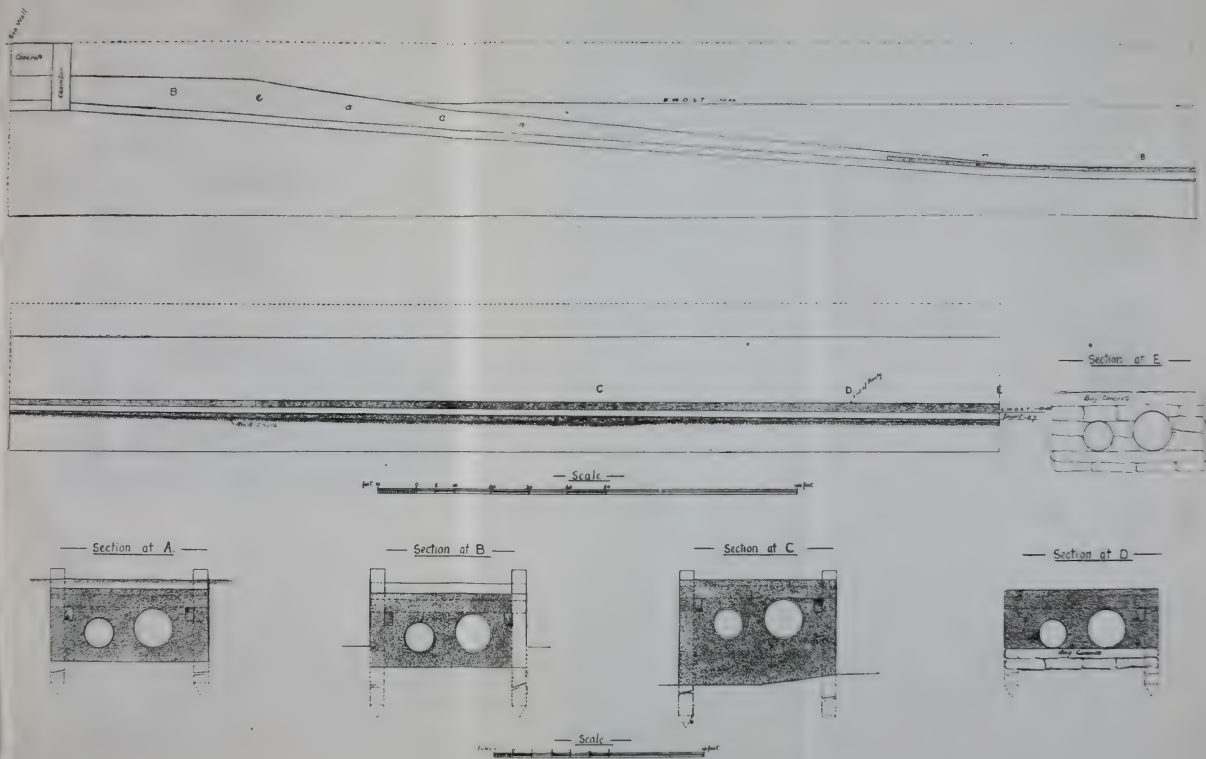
Concrete Mole Sewage Outfall into Sea, Seaford.
